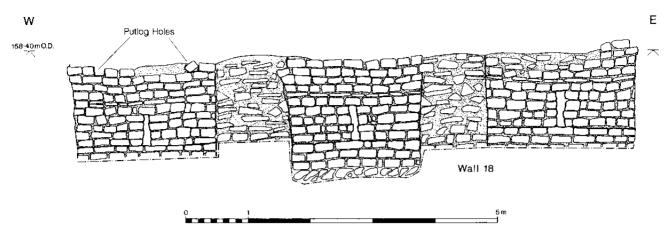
Elevation H (south face of south wall (18) Building 197) (for location see Fig 70)
